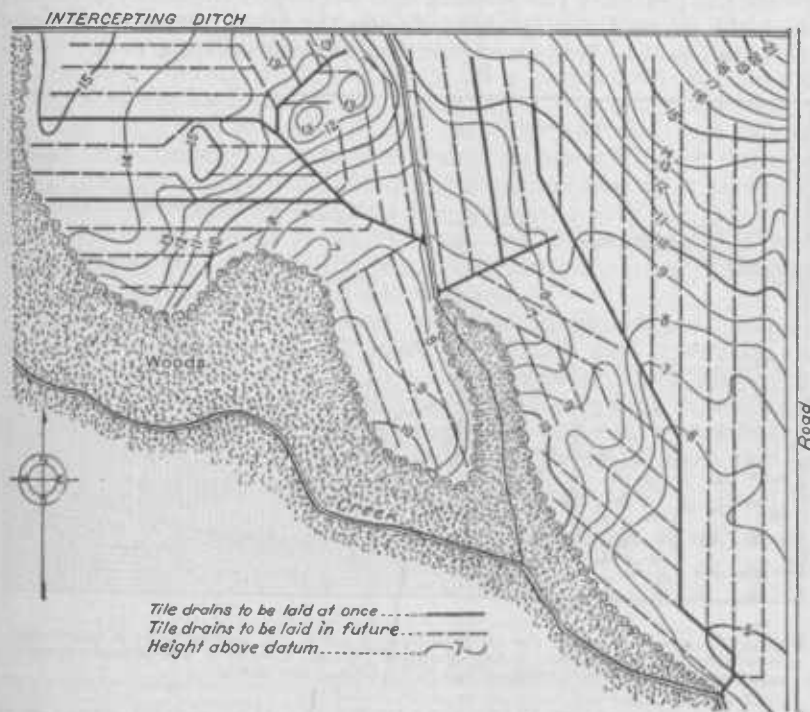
Random drainage system with provision for complete drainage to be installed later
